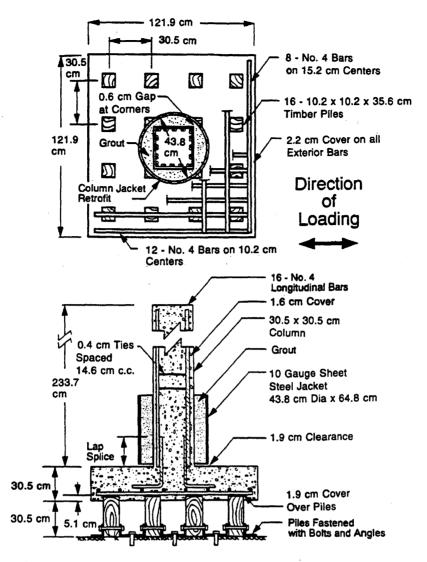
Details of specimen representing as-built conditions, Specimen No. 1 (1 in. = 2.5 cm).
